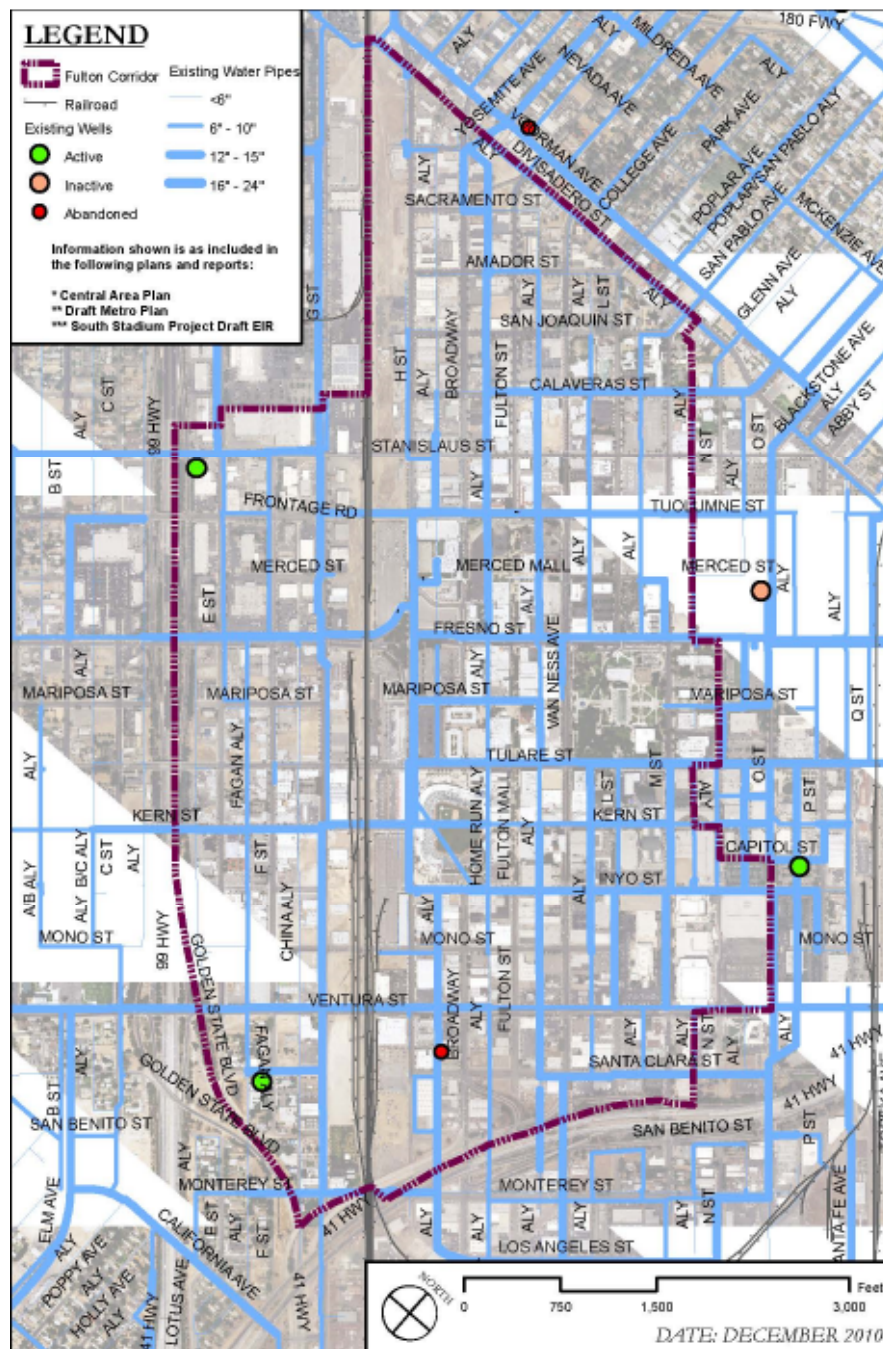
Existing Water Distribution System—Specific Plan Area
